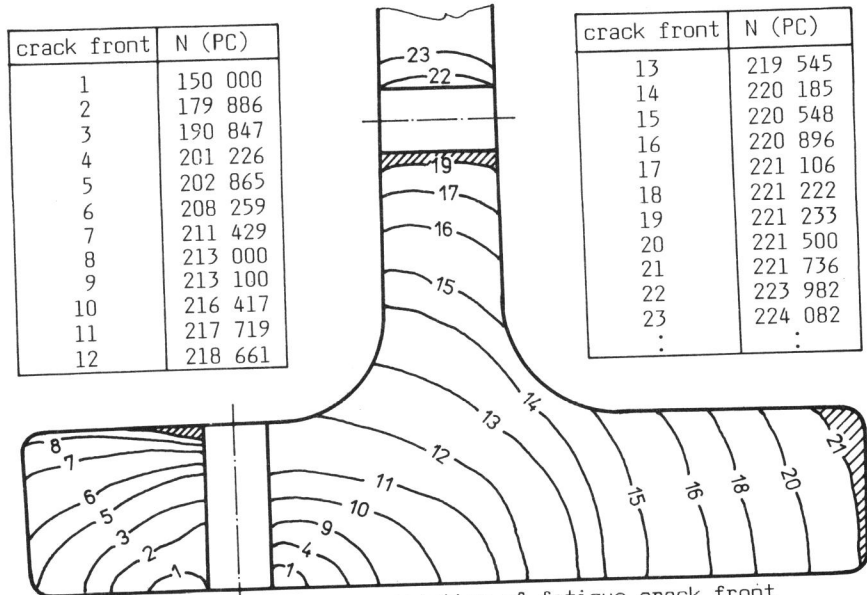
Fractographic reconstitution of fatigue crack front evolution (specimen No. 1) - information base for Fig. 7
